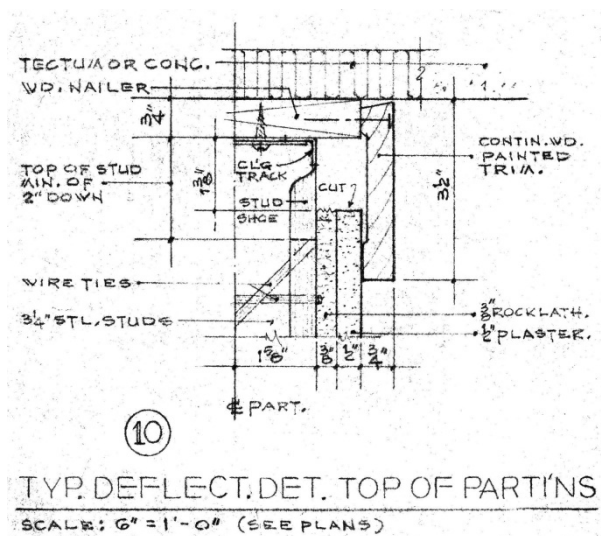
Typical detail at top of partitions to existing Tectum form plank. [From 1968 Drawing A-26, Detail 10.]
